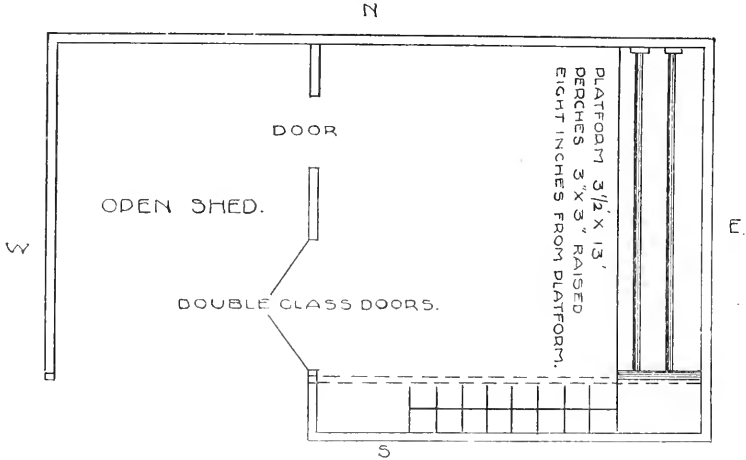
B.--Ground plan of poultry house. Scale  $\frac{1}{4}$  inch to the foot.
